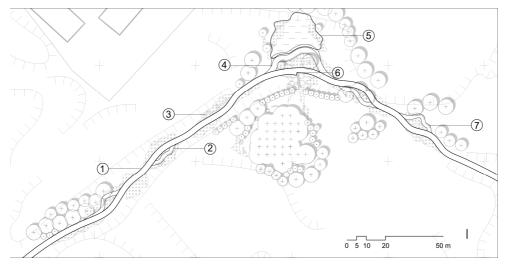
The rainforest garden plan: 1 – main wooden path, 2 – sitting place, 3 – stone steps, 4 – view point, 5 – water reservioir with waterfall, 6 – stairs, 7 – wooden benches and tables (own work)
